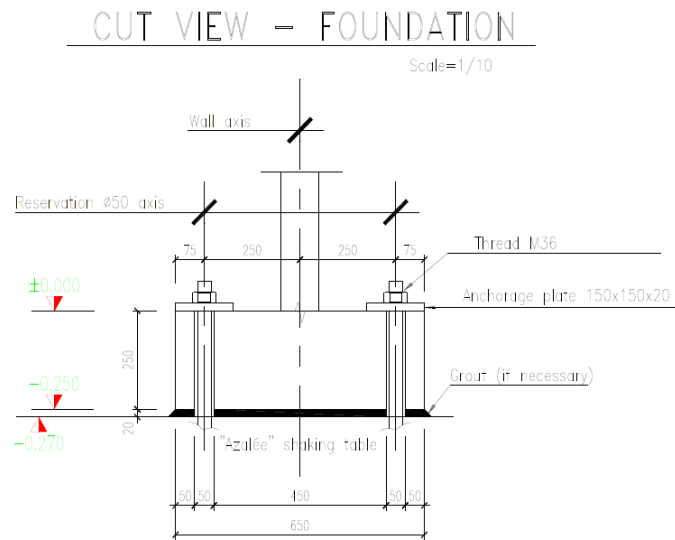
Anchorage system of the foundation on the shaking table - dimensions in mm.
